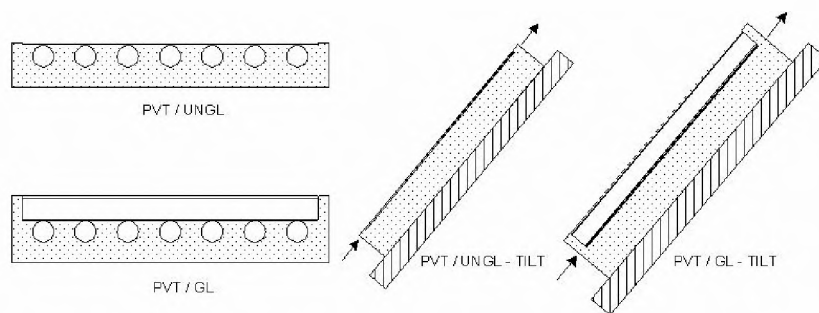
Cross section of the studied PV/T models (left) and their tilted roof installation (right)
